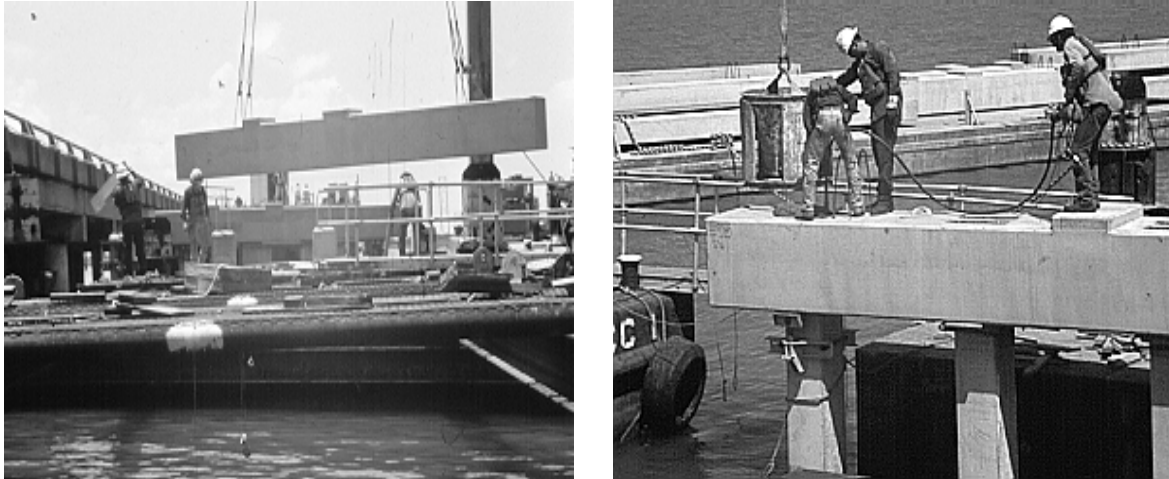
Precast pile caps for the Redfish Bay low water crossing. A minimal amount of cast-in-place concrete is used in making cap to pile connections.
